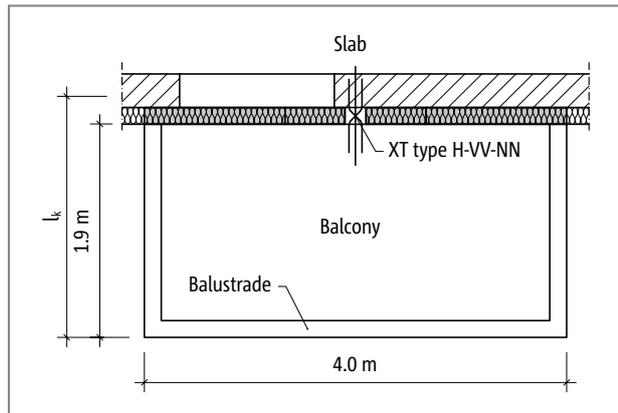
Schöck Isokorb® XT type K, H: Plan view
